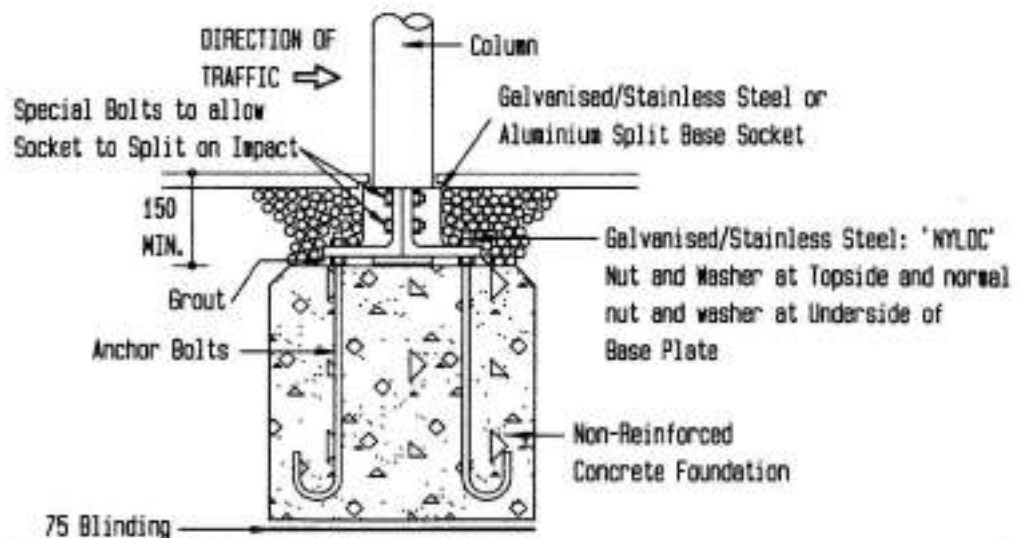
Cylindrical Foundations for support Stub Posts
